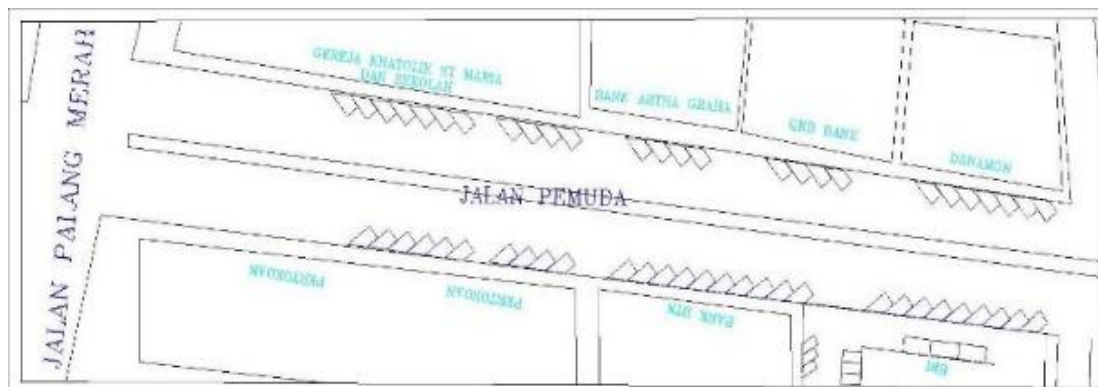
Alternative parking arrangement 1 Section B corner 45°
